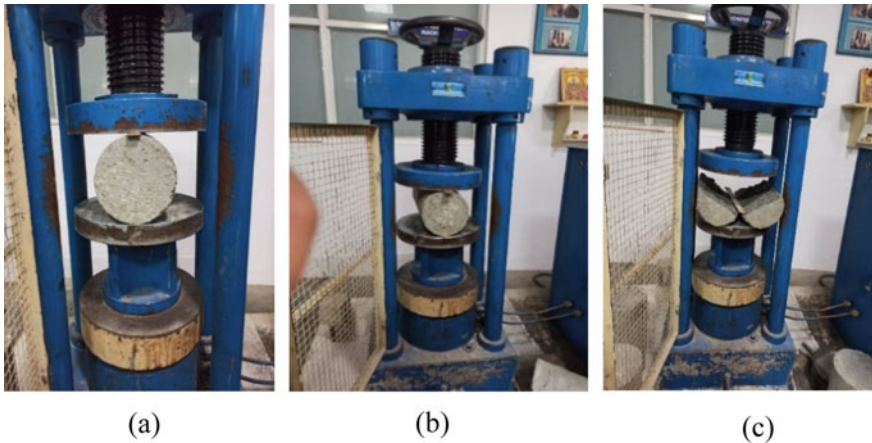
a Compression testing machine (split tensile test), b cylinder before testing, c cylinder after testing
